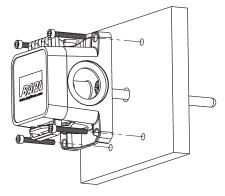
BAPI-Box Crossover Mounting to the Duct
